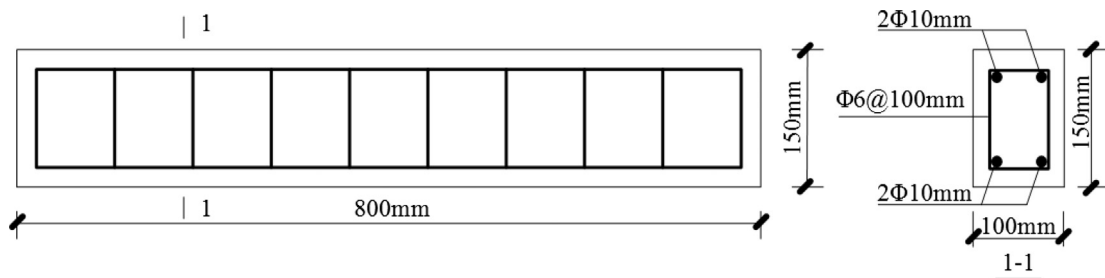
Reinforcing details and dimension of RC beam specimens.
